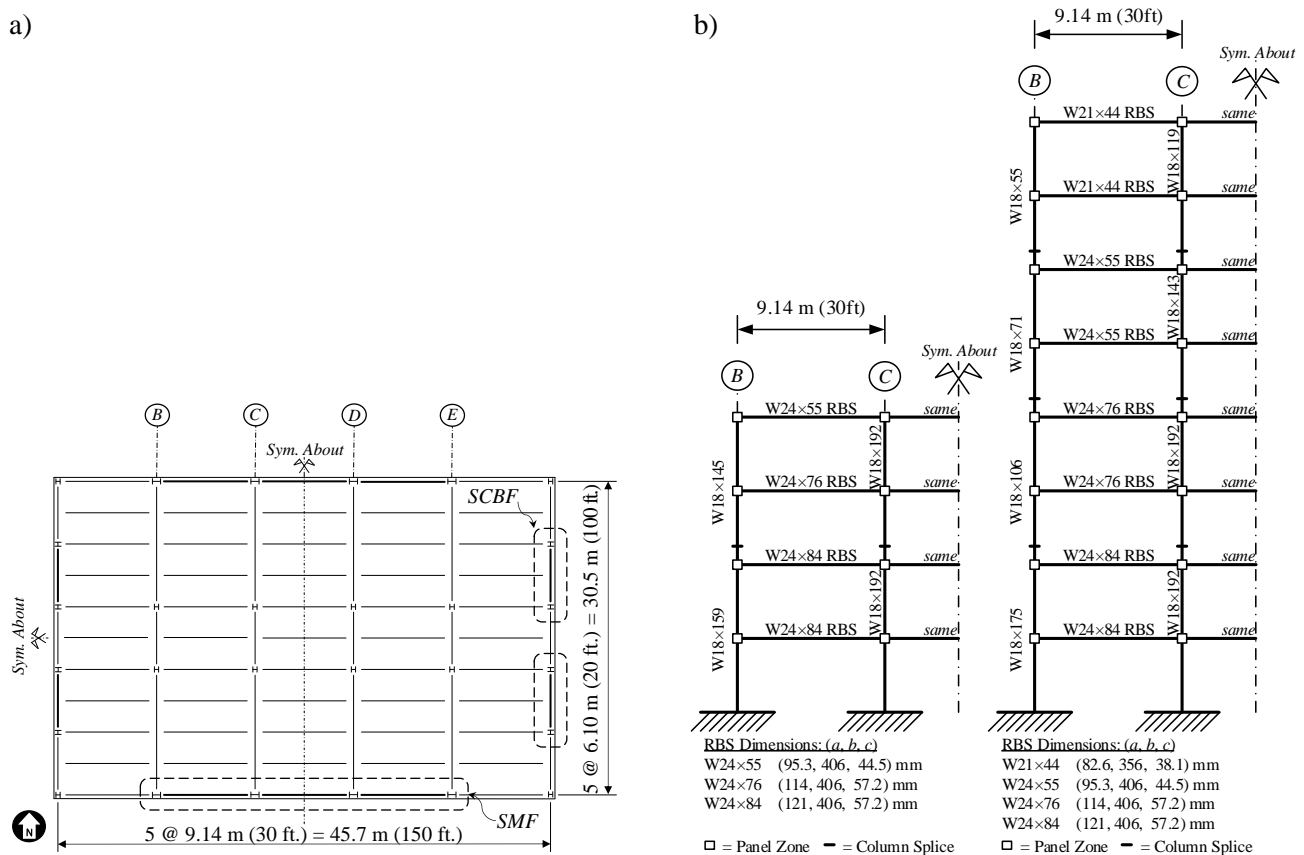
(a) Floor plan and (b) SMF elevations for the archetype buildings used in this study.
